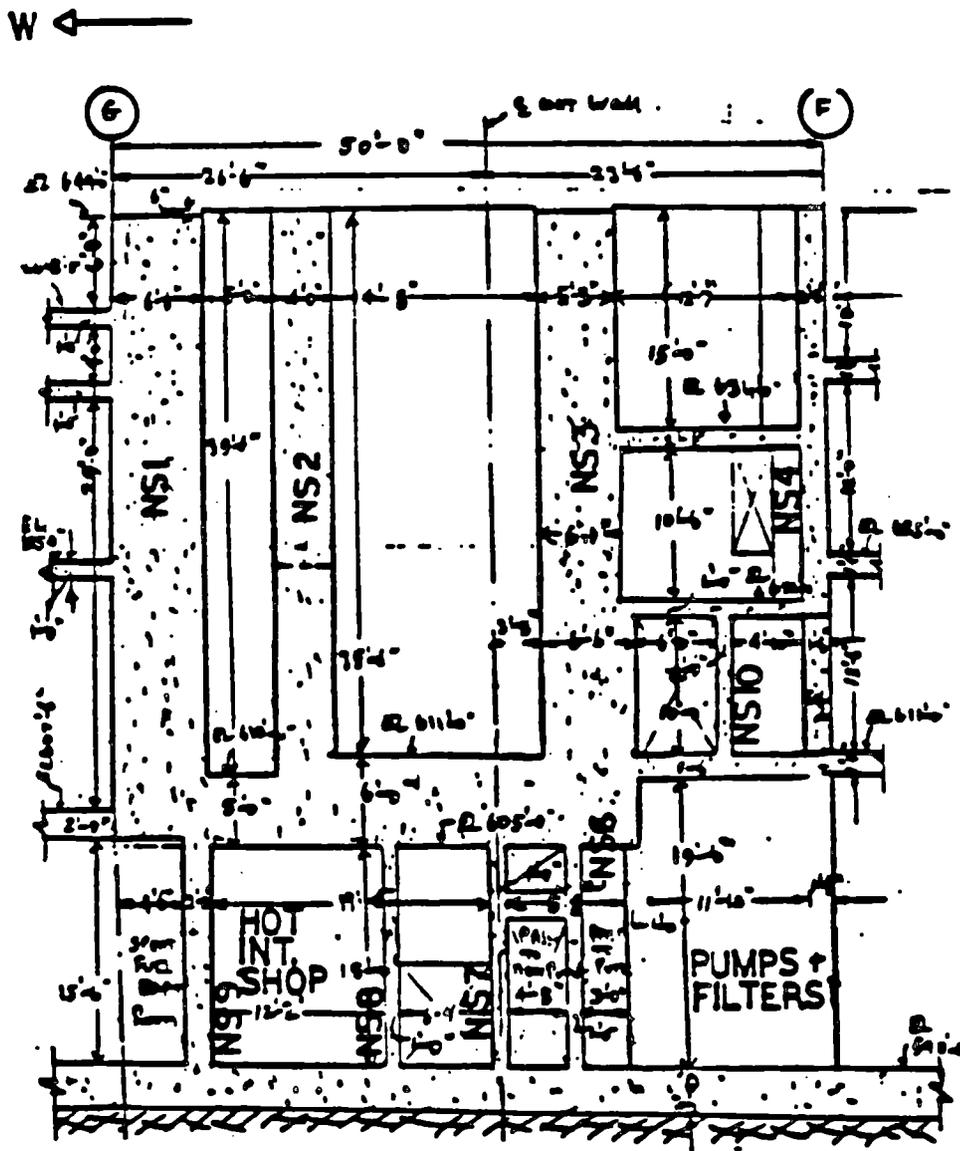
Section F-F - Elevation 590 ft to 649 ft
